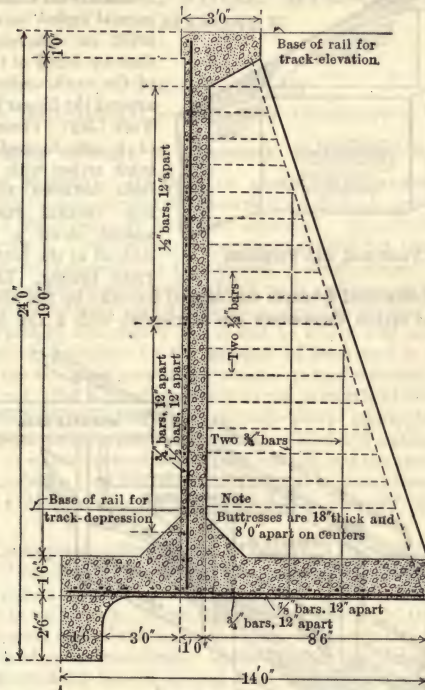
Reinforced-concrete Retaining-wall with Counterforts and Apron
